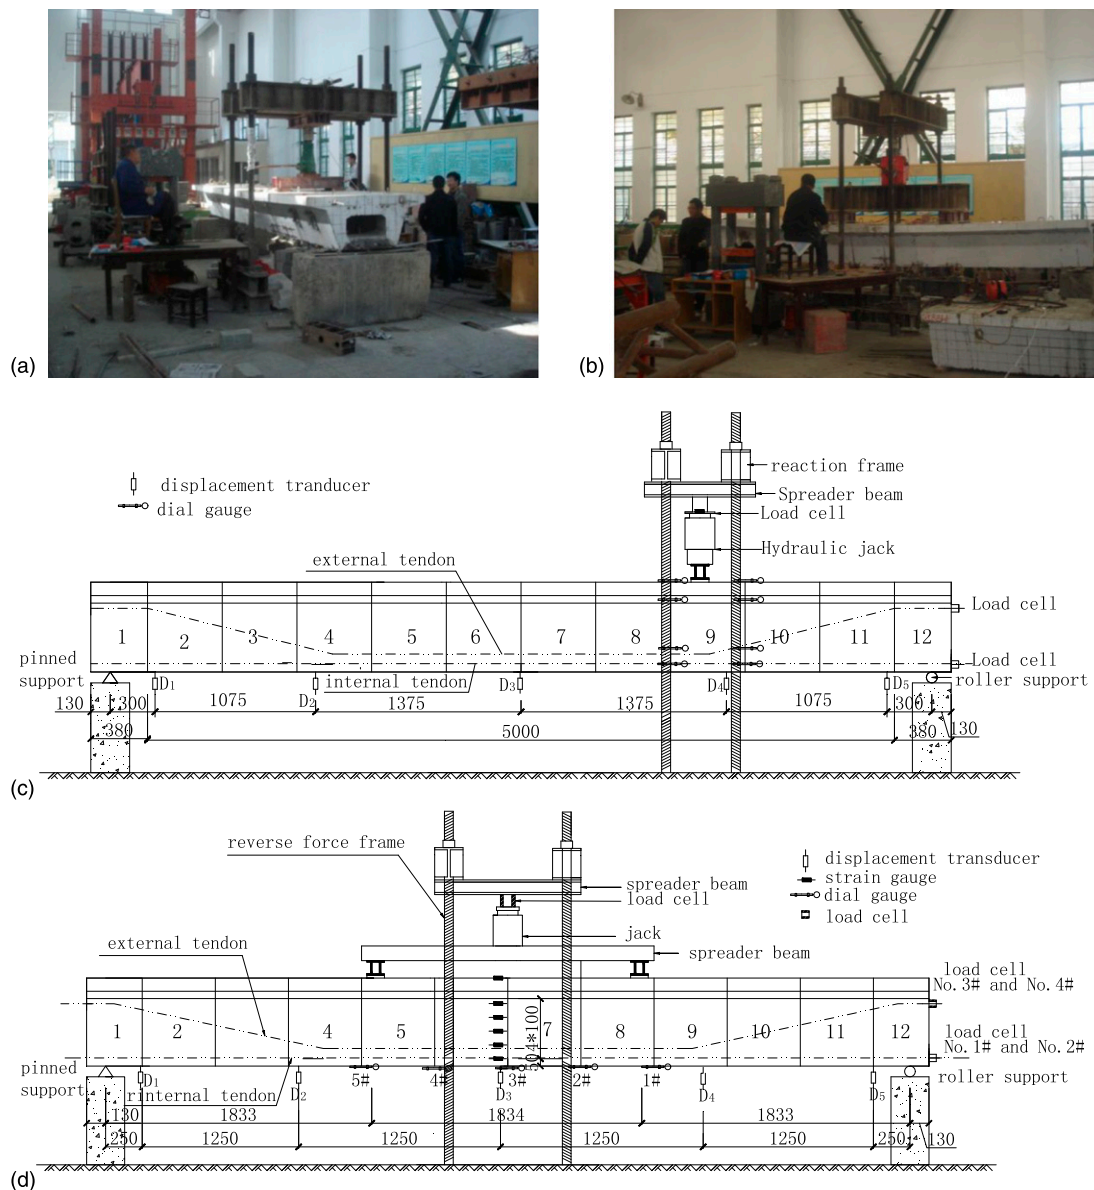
Test setup and instrument layout: (a) three-point loading; (b) four-point loading; (c) instrument layout for concentrate load (millimeters); (d) instrument layout for four-point load (millimeters)
